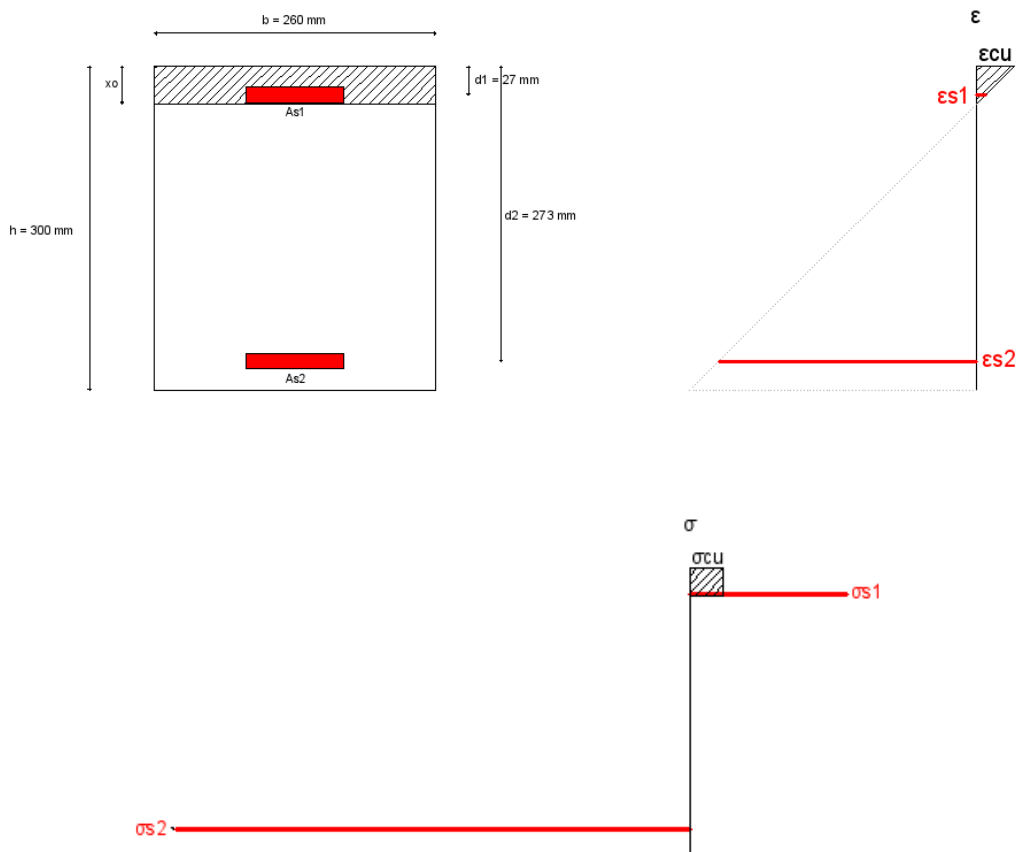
1<sup>st</sup> floor beam (300) section before strengthening
